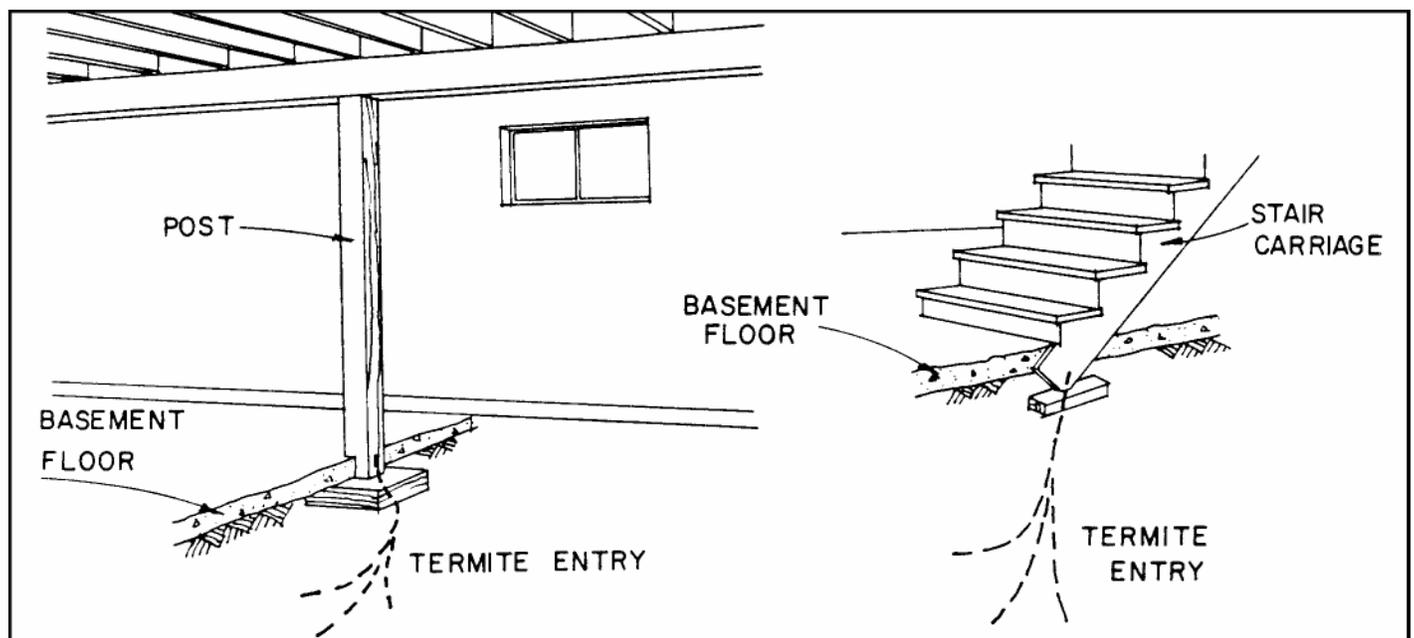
Wood post and basement steps extending through concrete (adapted from NPMA).
